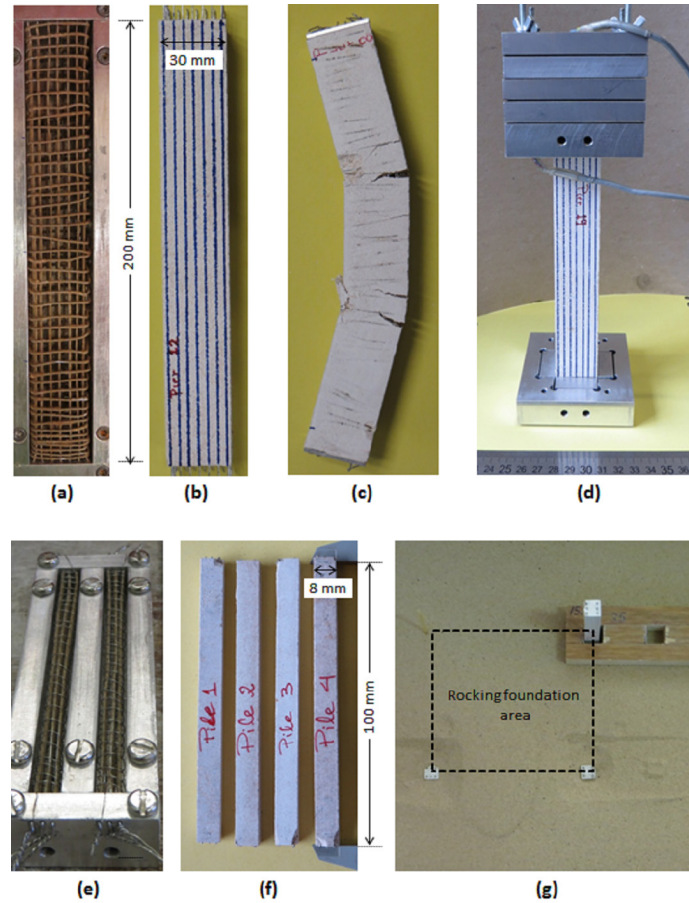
Construction of reinforced concrete model columns and piles: (a) pier column reinforcement within formwork; (b) and (c) pier column model before and after element testing; (d) the assembled deck-column-foundation model; (e) pile reinforcement in formwork; (f) RC pile models; and (g) pile placement procedure indicating the area that the foundation was placed upon.
